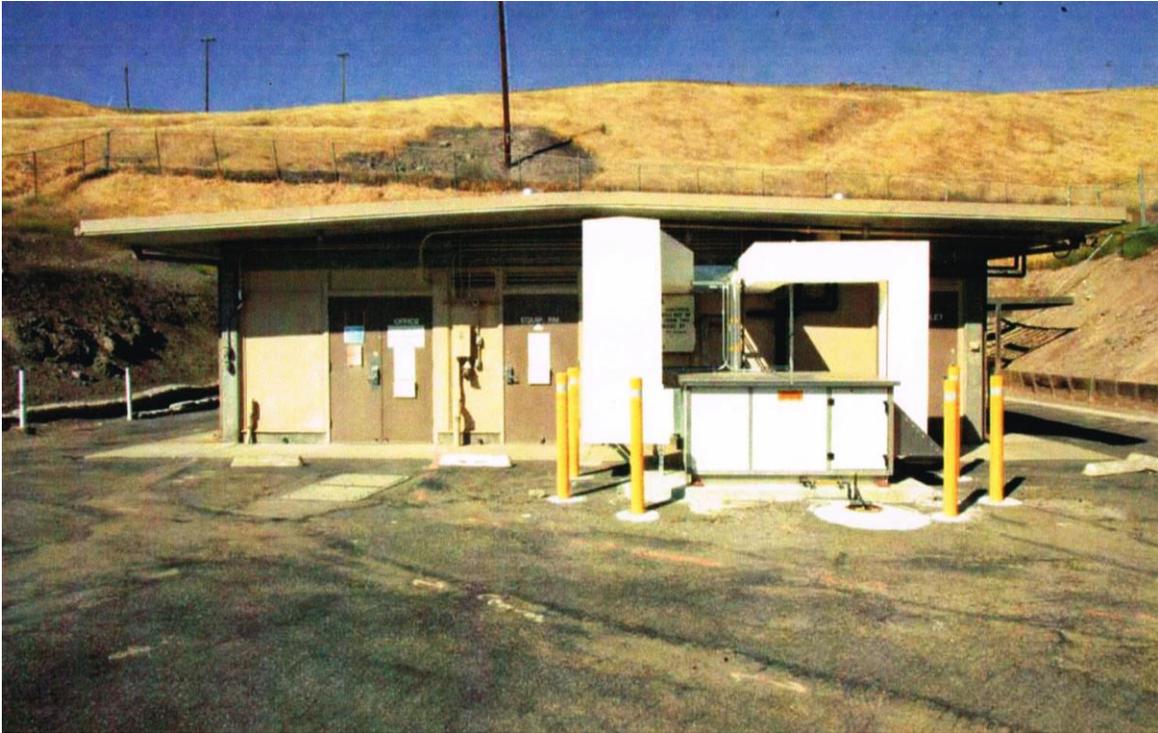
Building 826 Front elevation (Heidecker, 2009)
